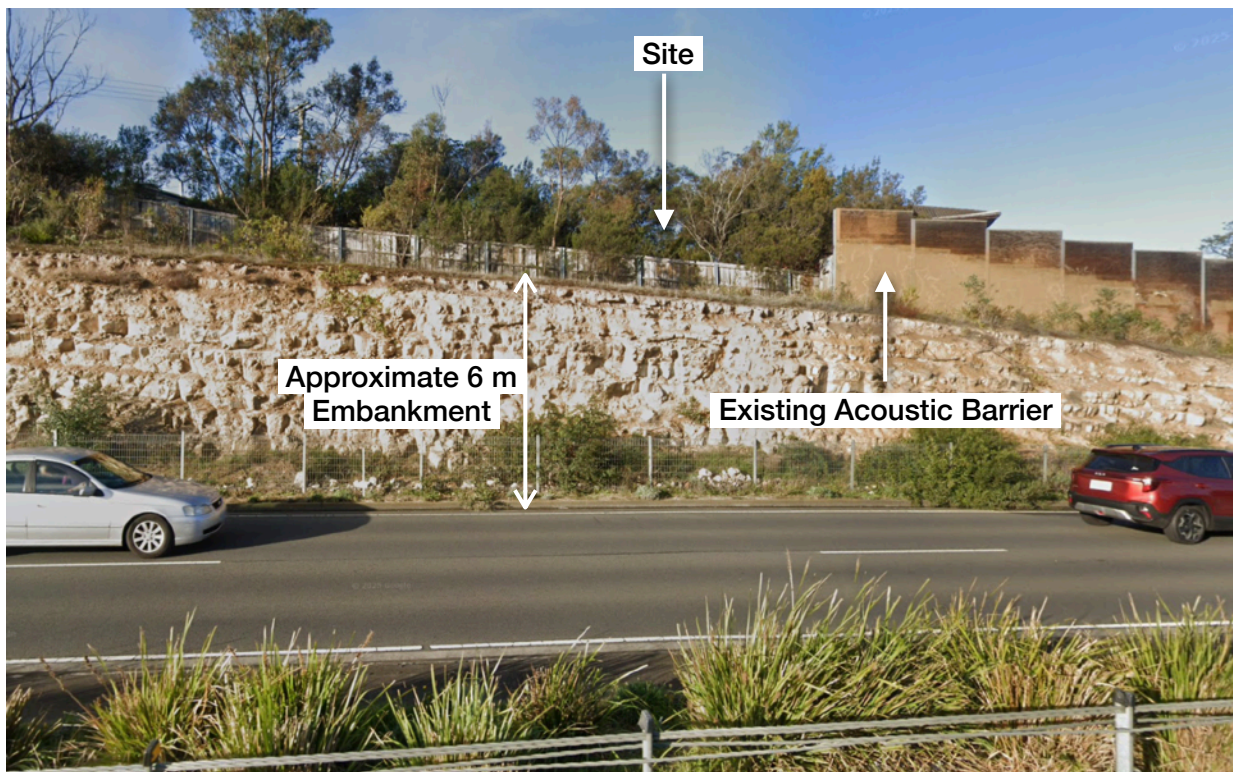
VIEW TOWARDS SITE FROM SOUTH ARM HIGHWAY
